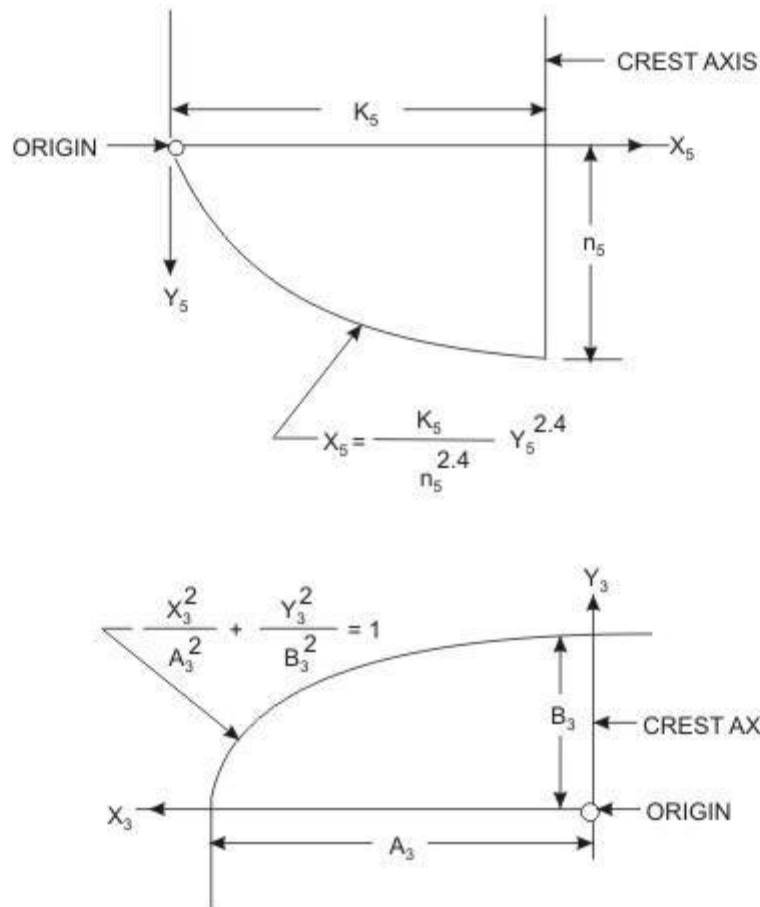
Upstream profile of ogee crest and bottom profile of breast wall details
